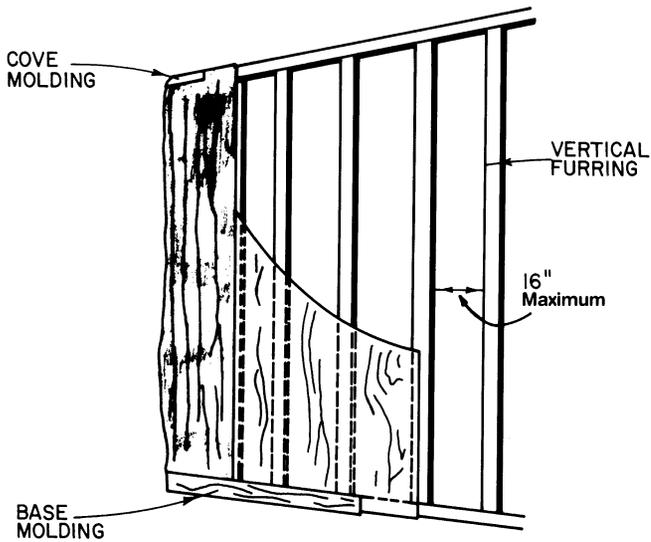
Application of wall paneling over vertical furring strips, 16 in on center. All panel edges must be supported (Masonite Corp.).
